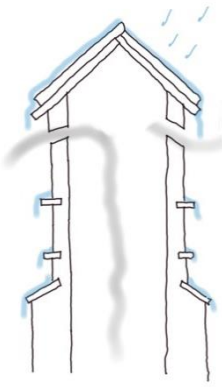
Section plates of the chimney organize better rain water flow and improve air movement.
